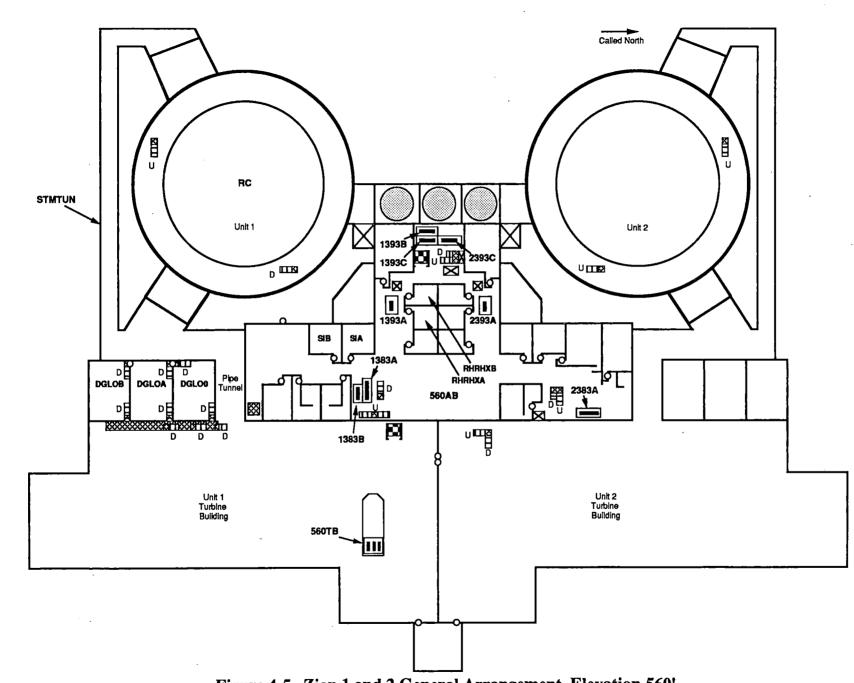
Zion 1 and 2 General Arrangement, Elevation 560'
